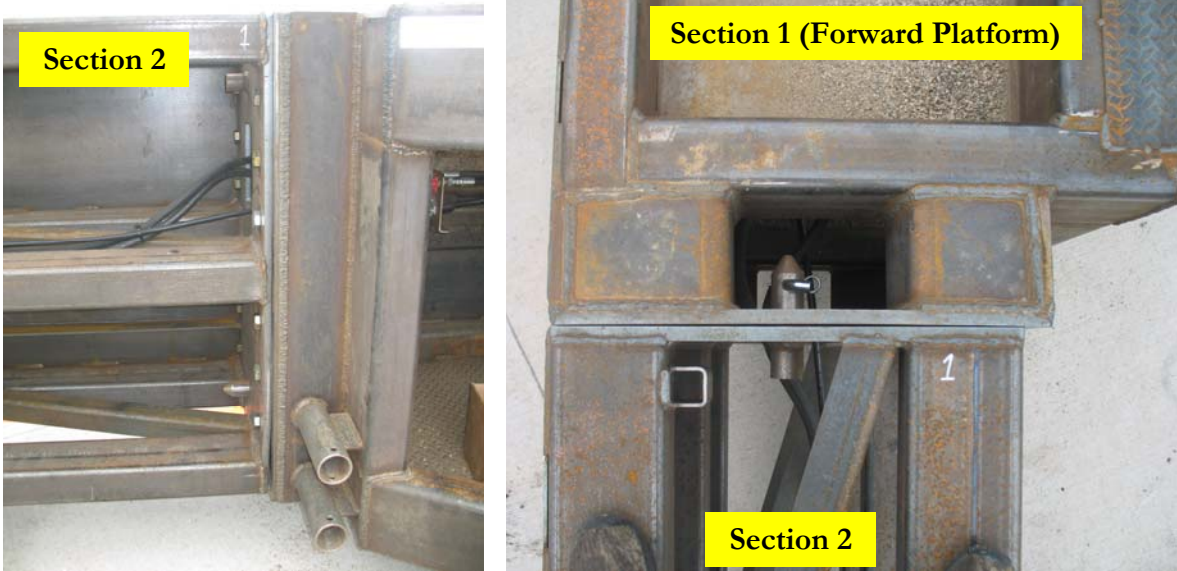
Post Impact Condition of Joint 1 (Connecting Sections 1 and 2)
